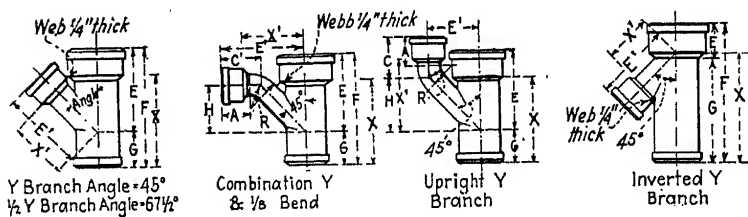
Details of cast-iron soil pipe Y branch.
